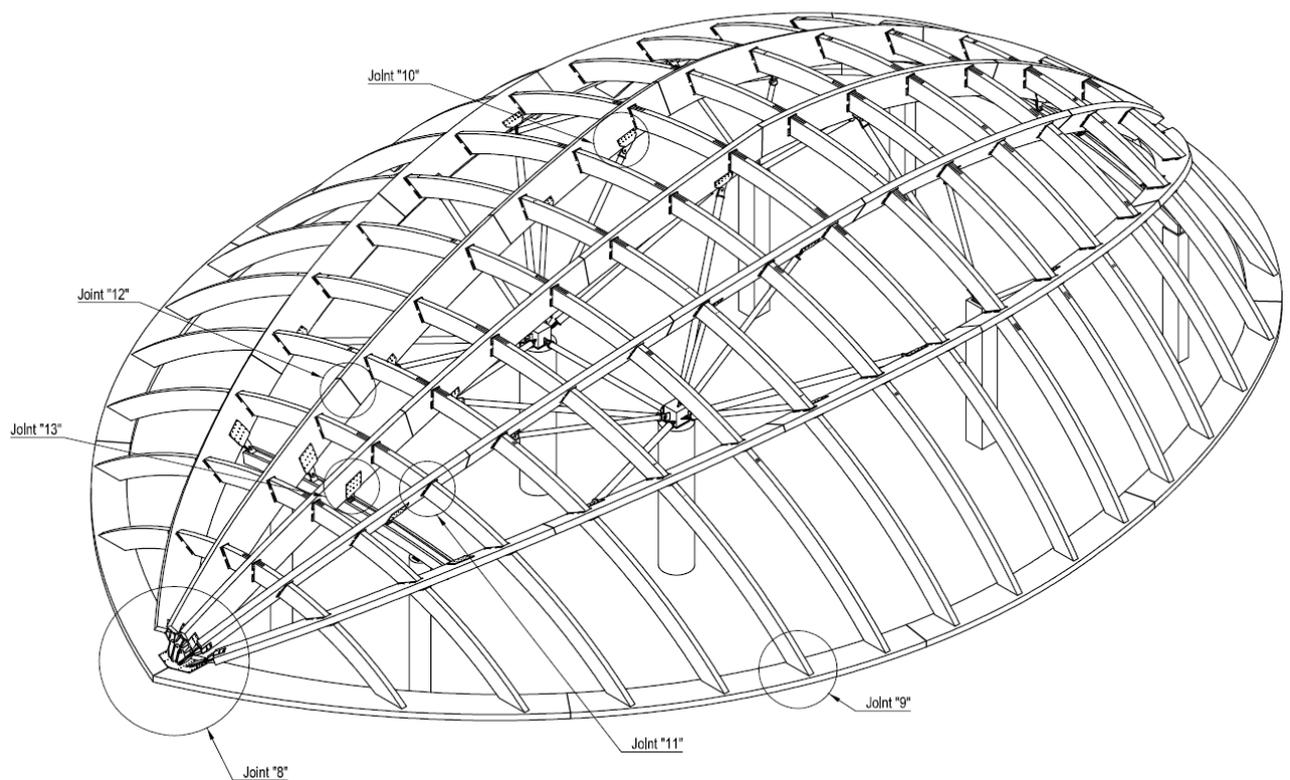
The 3 dimensional view of the lookout restaurant in Banana Island, Doha, Qatar
